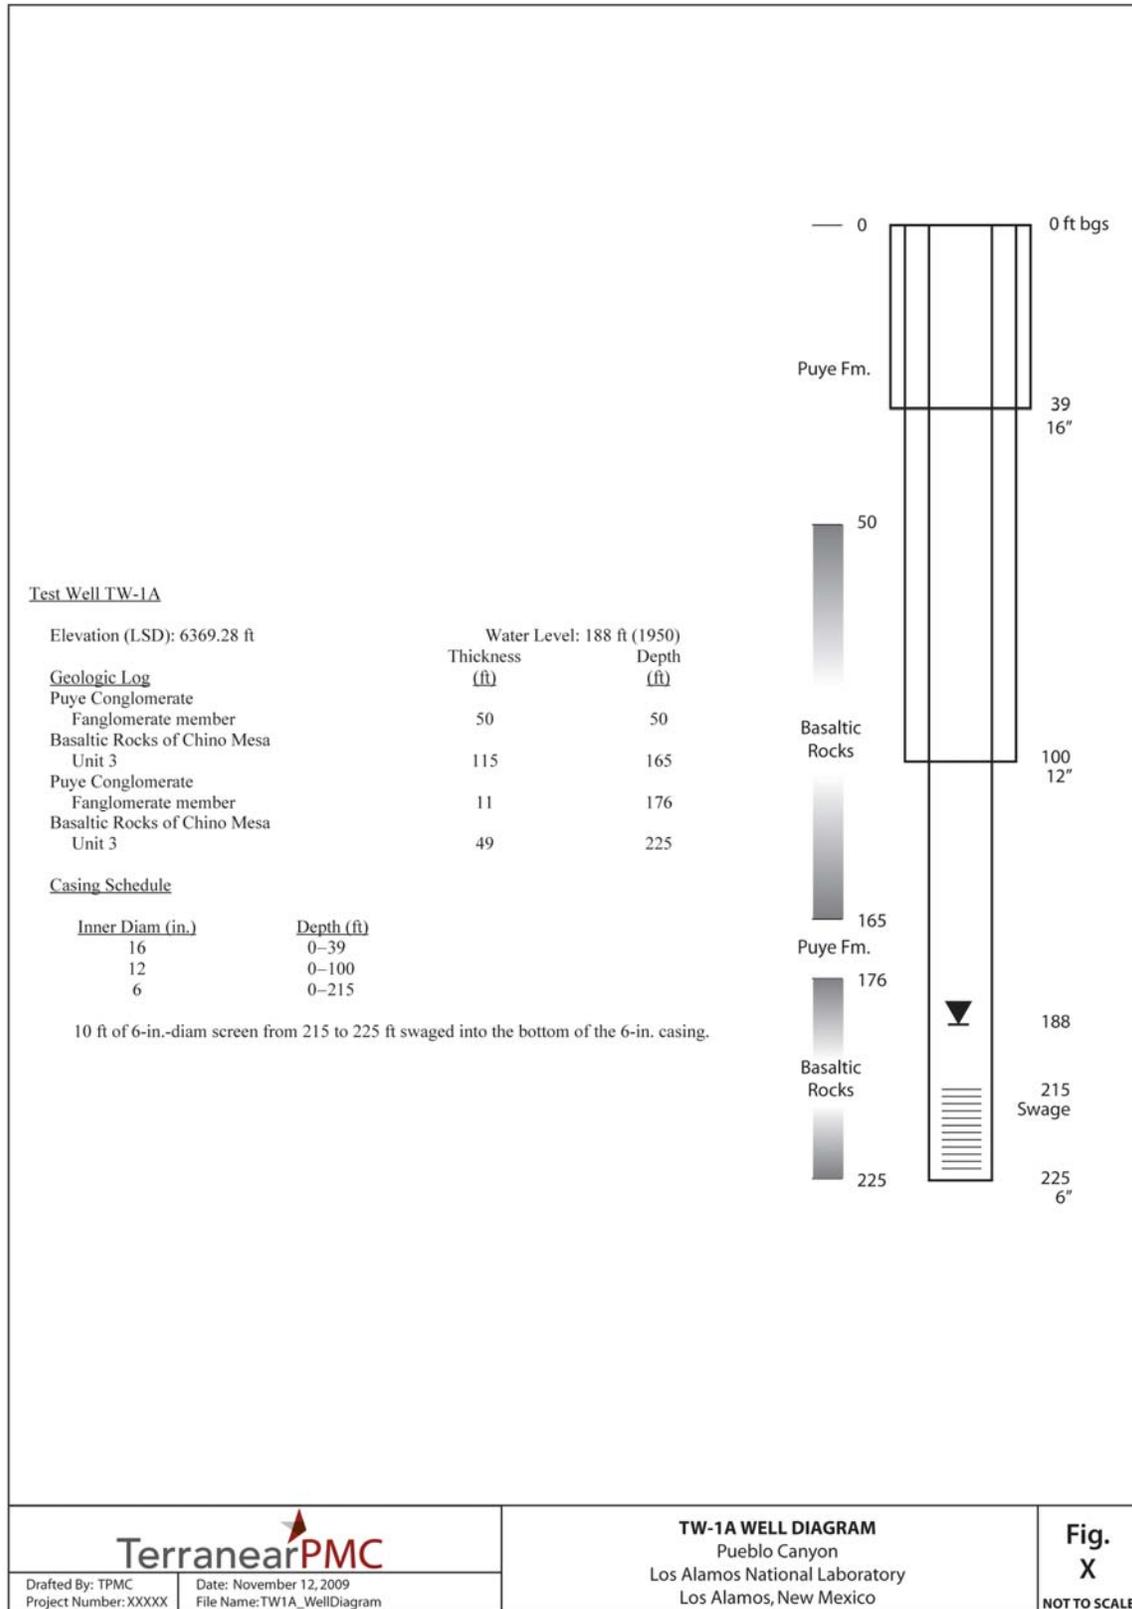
Monitoring well TW-1A as-built well construction diagram
